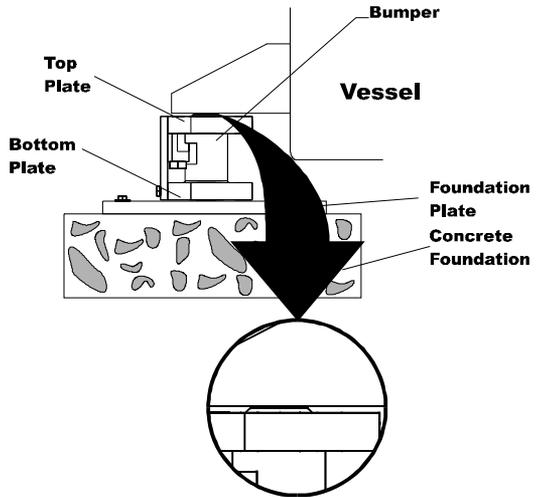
LOWERING VESSEL SUPPORT PLATE ONTO THE LOAD POINT ASSEMBLY
